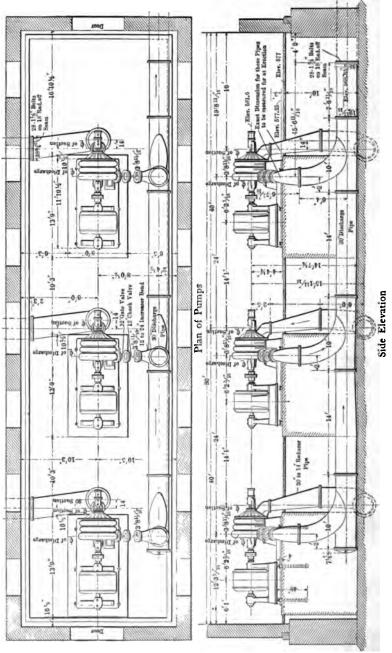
Plan and Side Elevation of Three 12-inch Three-stage Pumps.
